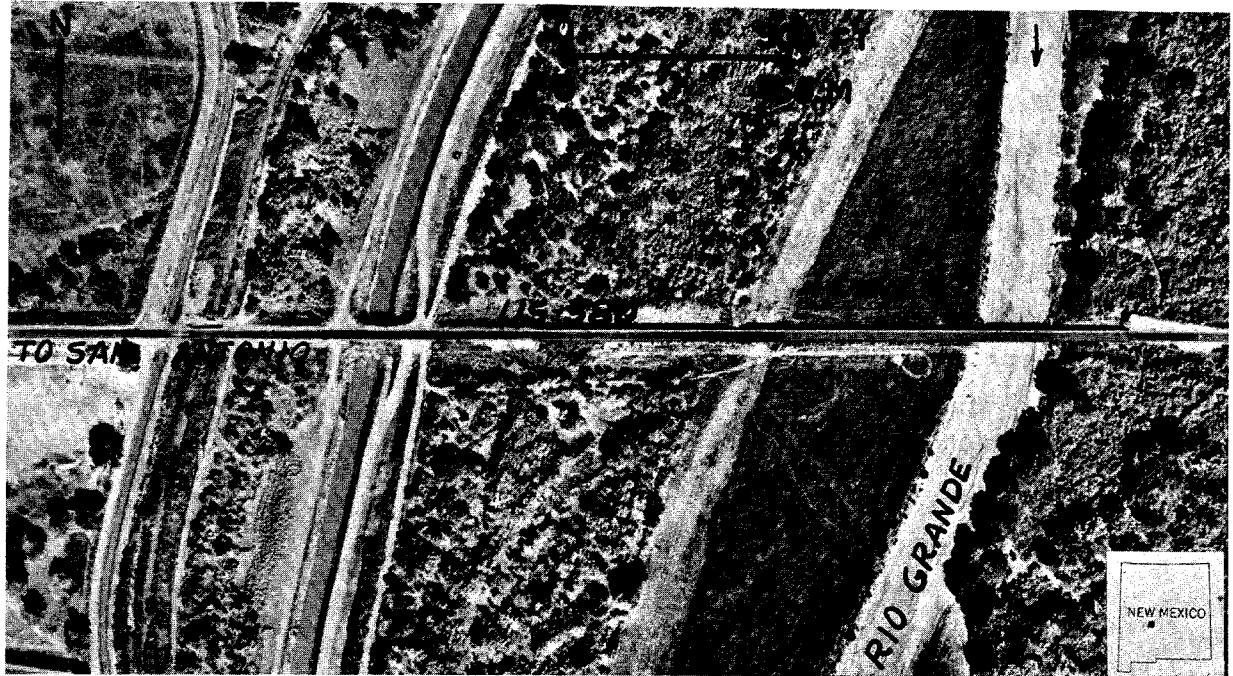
Aerial photograph of US-380 crossing, Rio Grande River, in 1973. (From New Mexico Dept. of Highways.)
